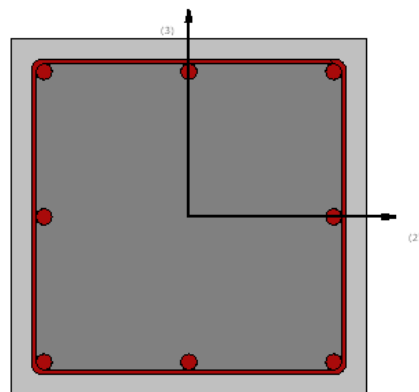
Rectangular column section 0.45x0.45 (8 No.20) for floor (1, 2, and 3).
